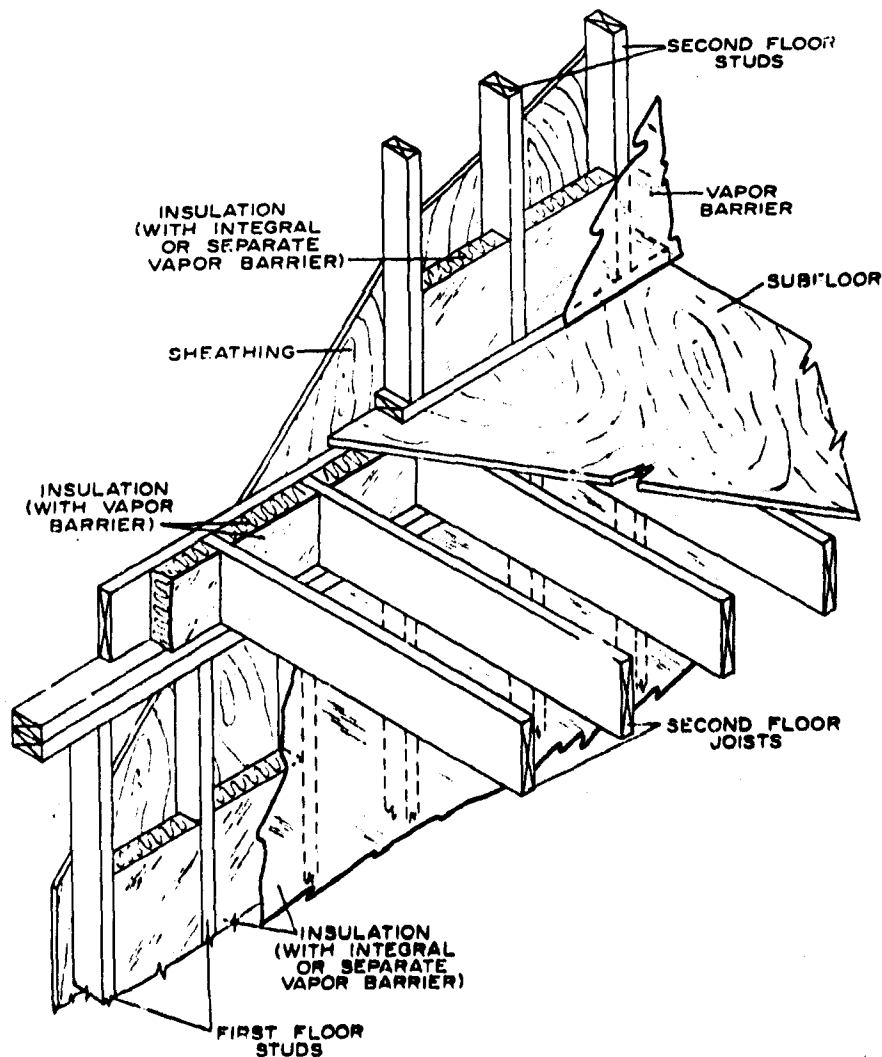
Vapor barriers in walls and joist space of two-story house.
